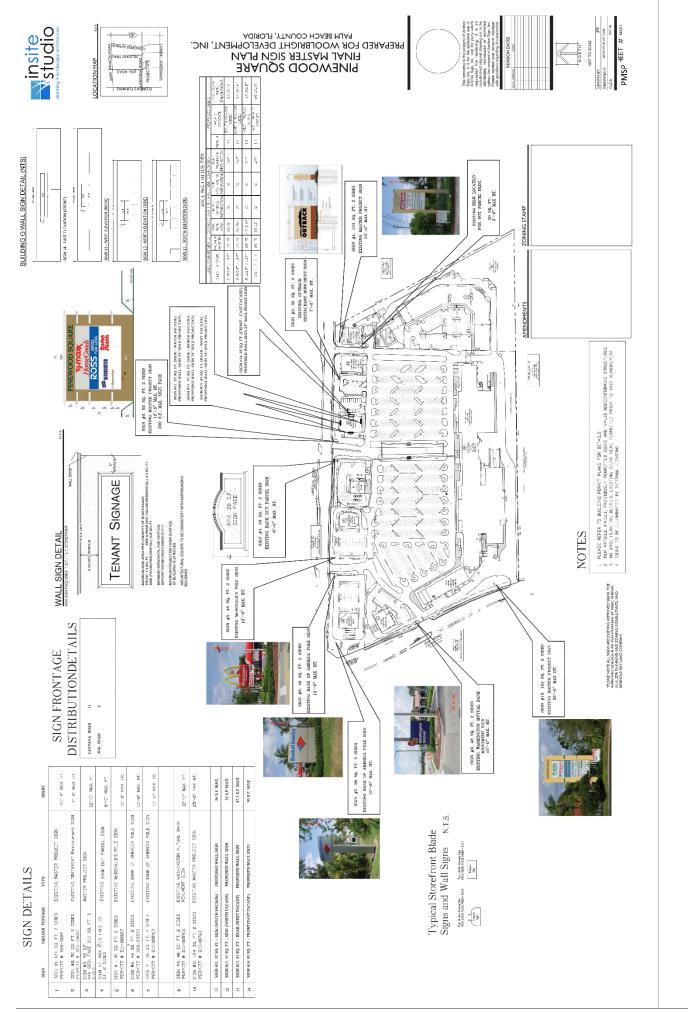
Preliminary Master Sign Plan (PMSP) dated April 26, 2021
